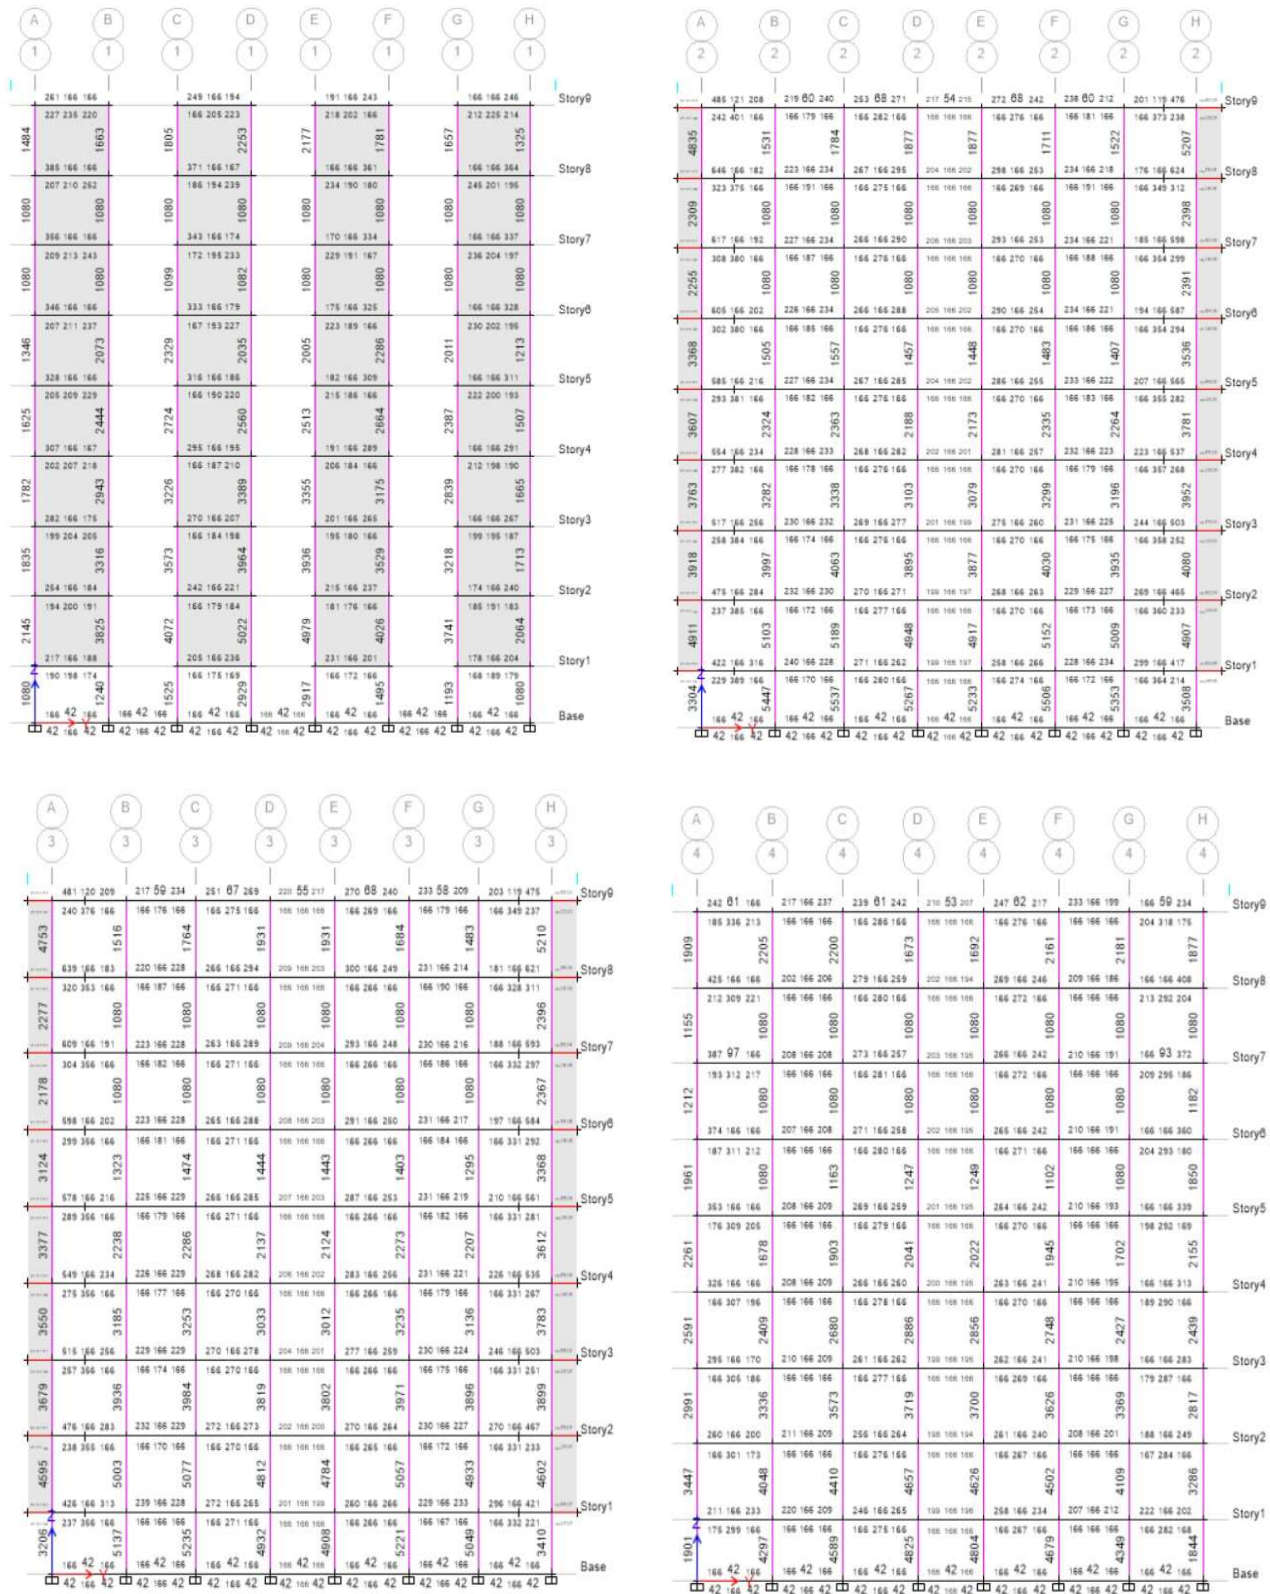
Area of Steel Required in Column and Beams (Along Grid [1-4])
